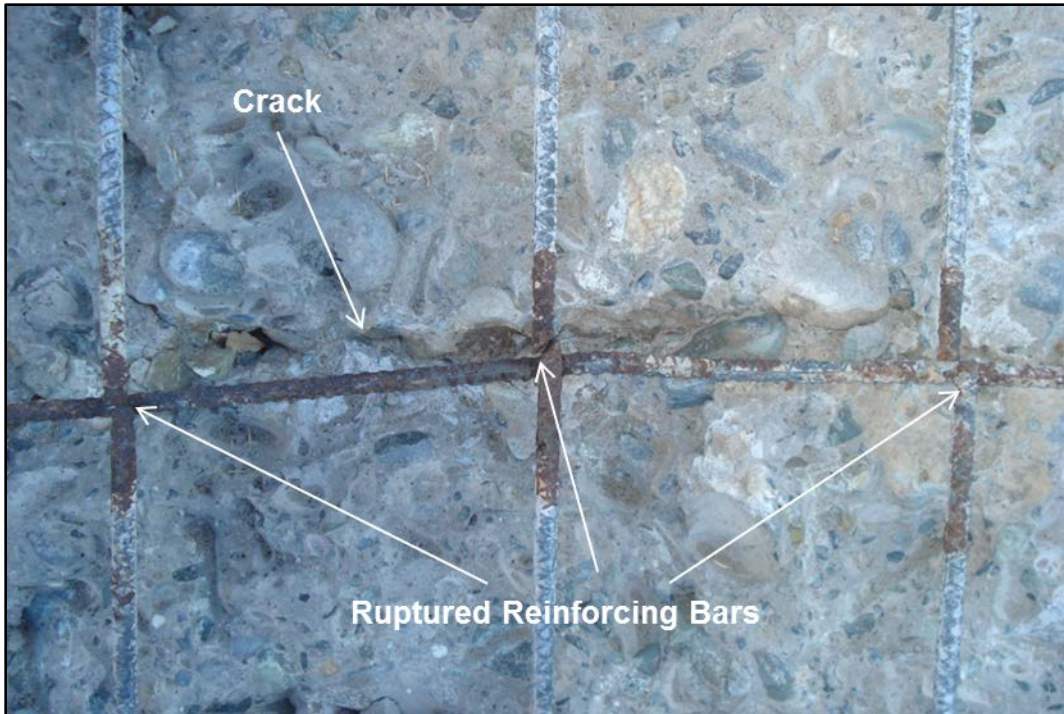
Corroded and ruptured steel reinforcing bars at a slab crack [11]
